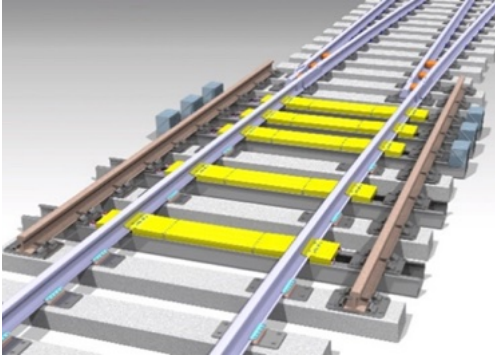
A new switch layout including triple redundancy in actuation and a novel stub switch joint.
